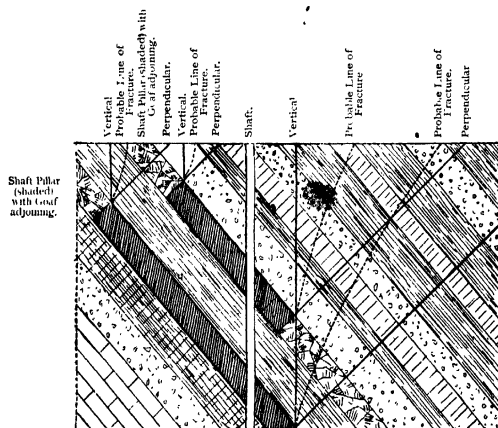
SECTION SHOWING COAL LEFT TO SUPPORT SHAFT IN AN INCLINED SEAM.
